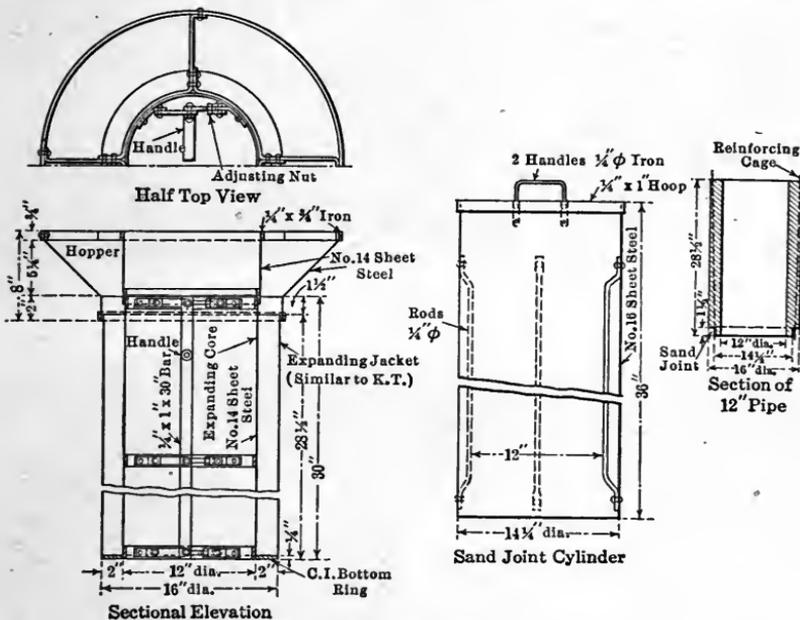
Moulds for making 12-inch reinforced concrete pipe. Tieton Project, Wash.
